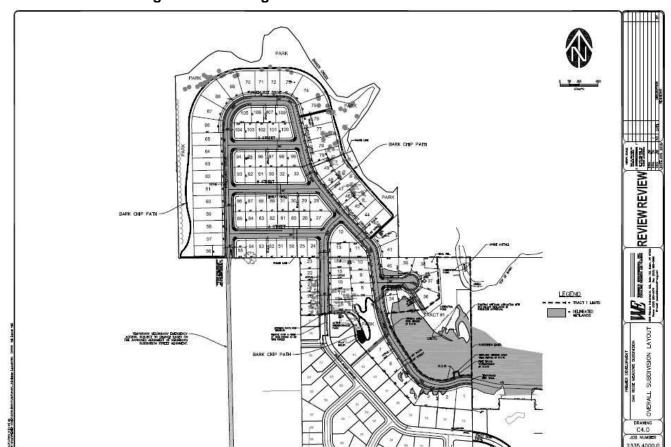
Oak Ridge Meadows Tentative Subdivision Plan
